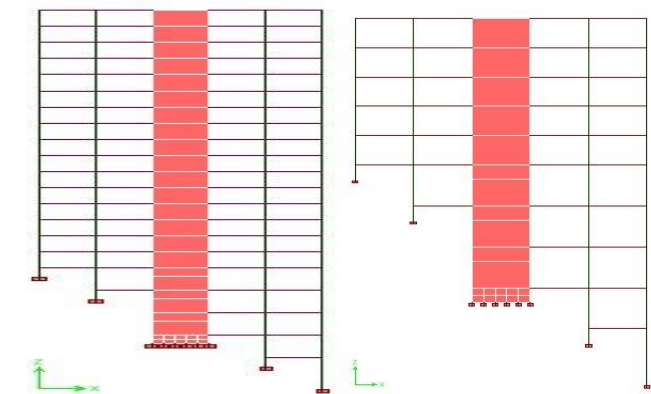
G+15 and G+4 Storey building, 40° Ground slope
